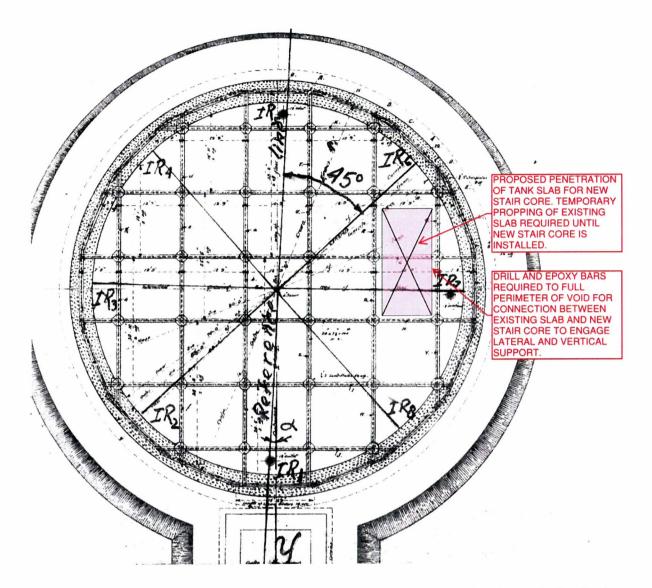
Existing tank slab framing plan with proposed stair penetration shown indicatively
